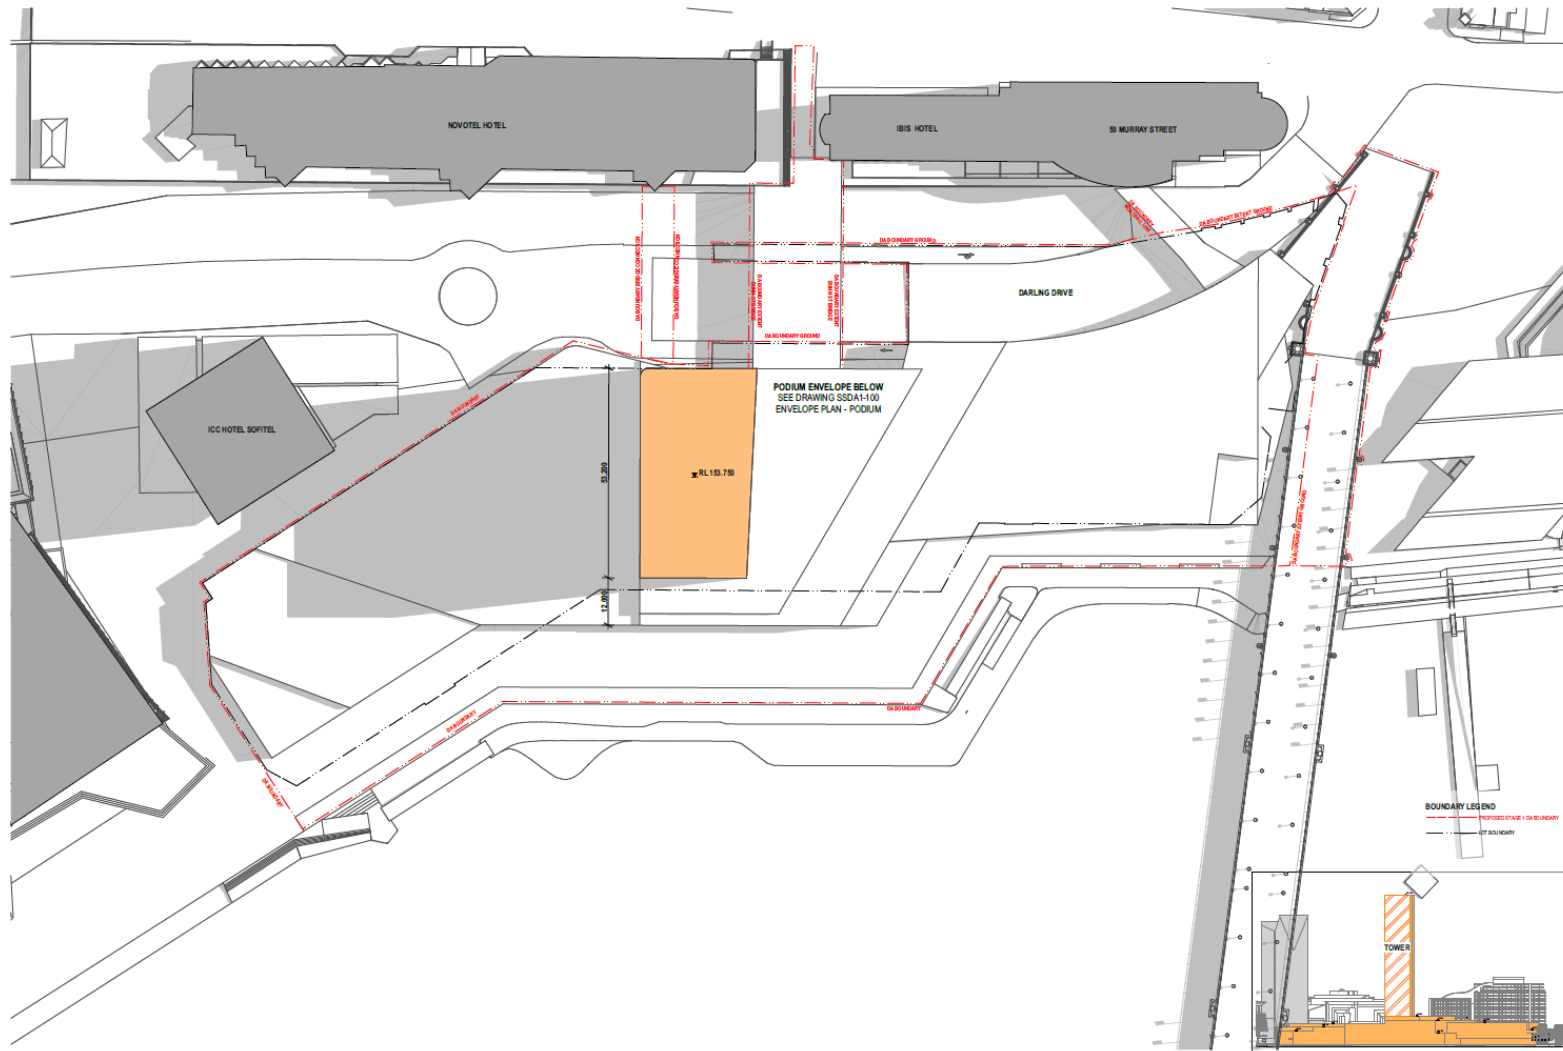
Envelope Plan – Tower (Source: FJMT, 2020)
